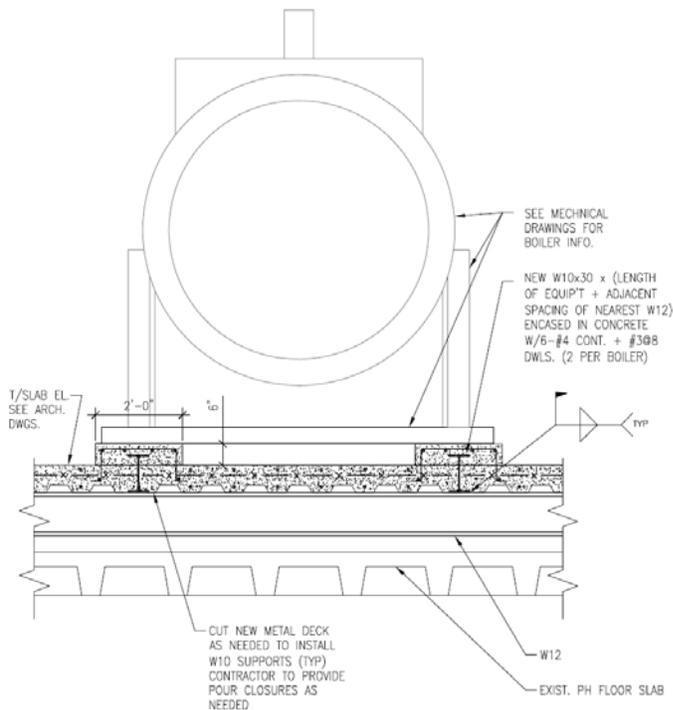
Installation of a boiler, please note the spring isolators, which sit upon the steel beams encased in concrete.
